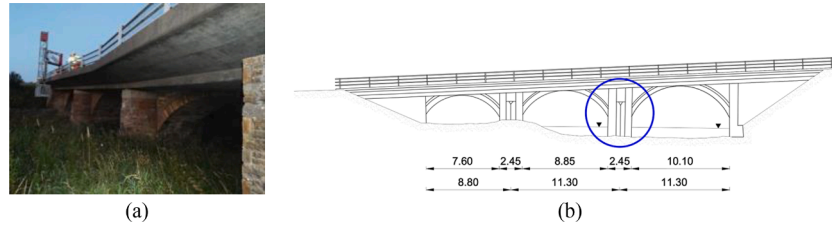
(a) A76 120 Guildhall bridge; and (b) bridge elevation.
